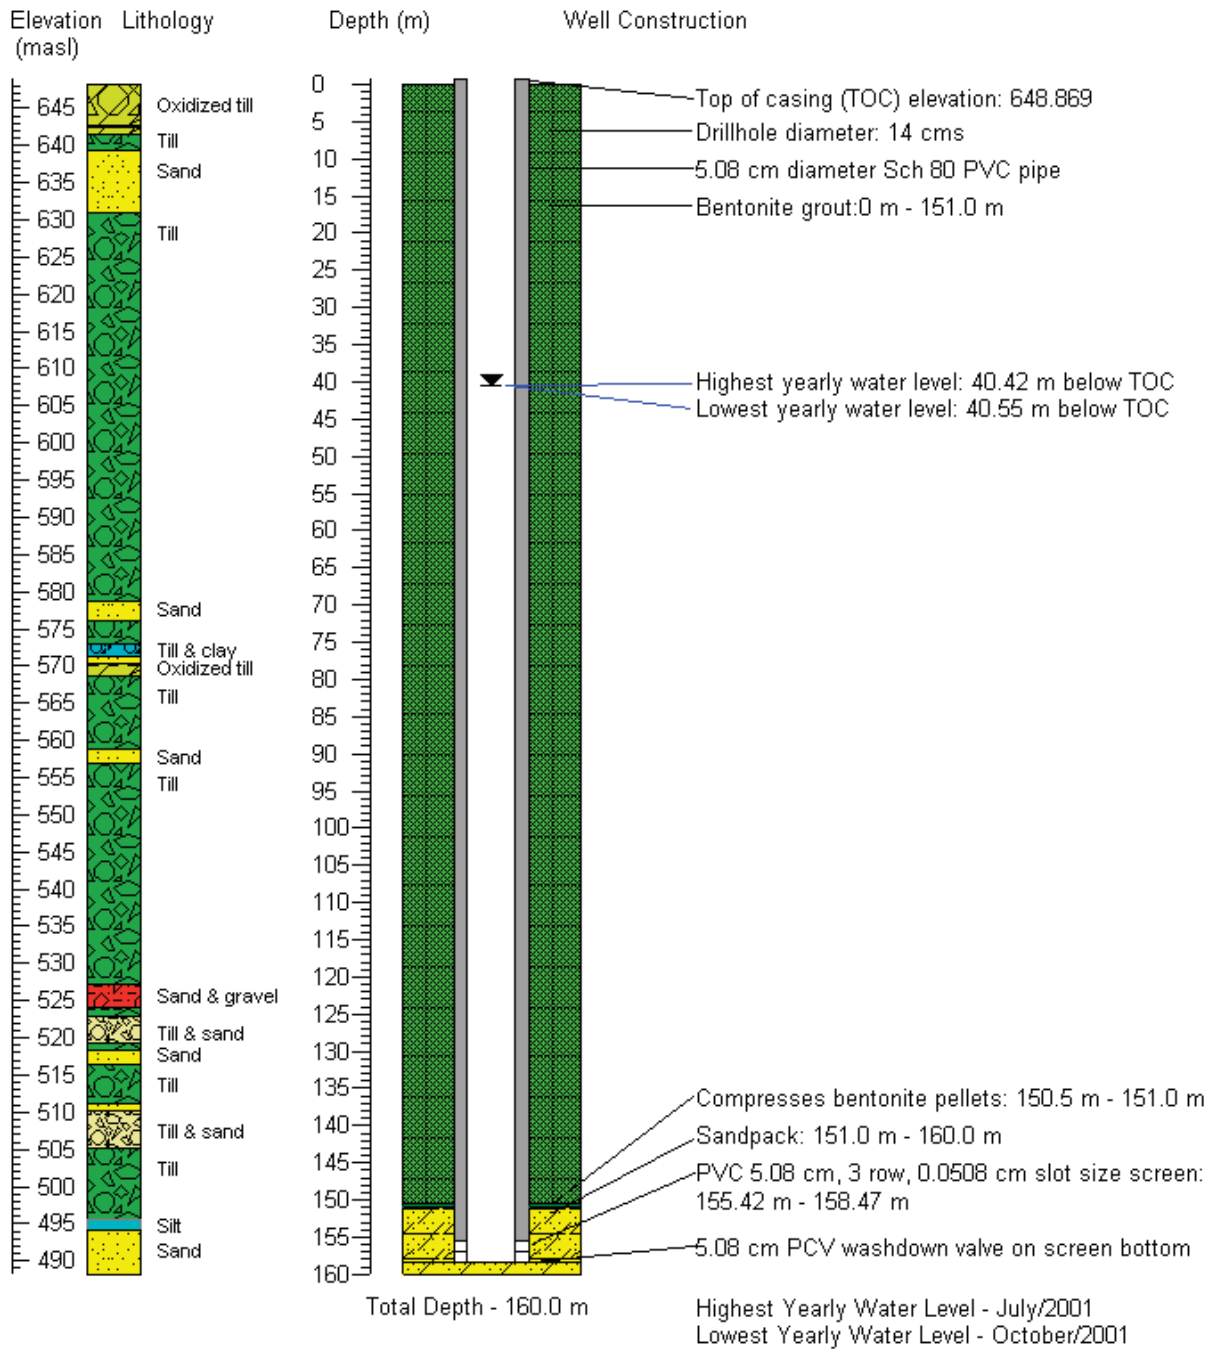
Piezometer construction details: WEPA 00-3-158
